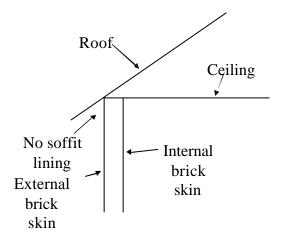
Illustration of a vulnerable unreinforced masonry building detail whereby the roof is solely supported on the external brick skin
